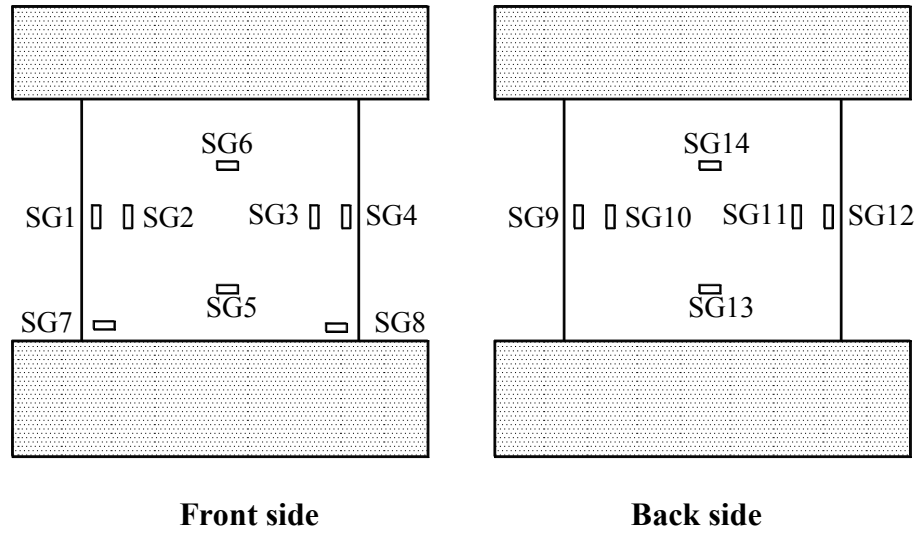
Locations of the strain gauges installed on FRP sheets of wall panel RW1.
